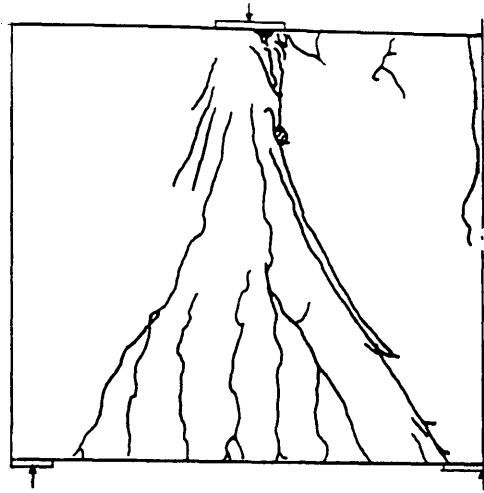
Predicted crack pattern and deformed shape at 600kN (TRGRAS3)
